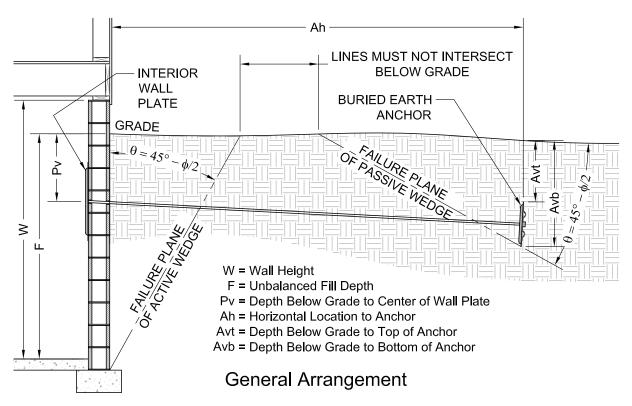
a General Geo-Lock® Wall Anchor System Arrangement
